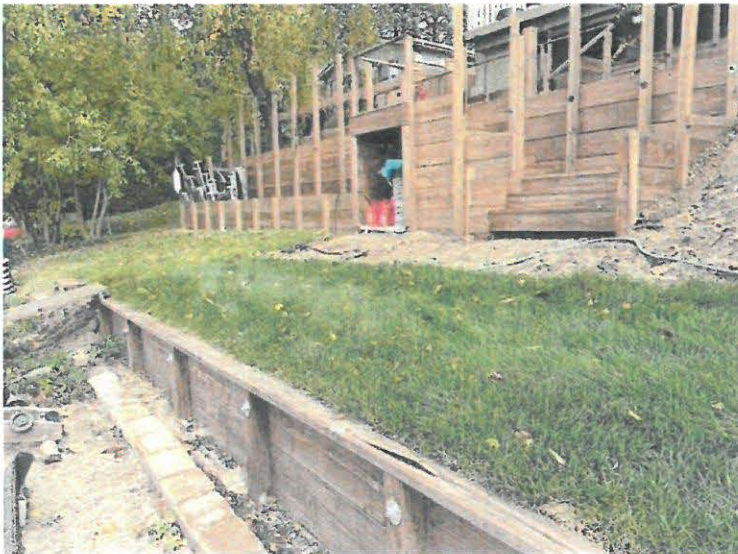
Looking north from south property line at the existing retaining wall at beach, This will be the limits of possible fill indicated on the plans.
